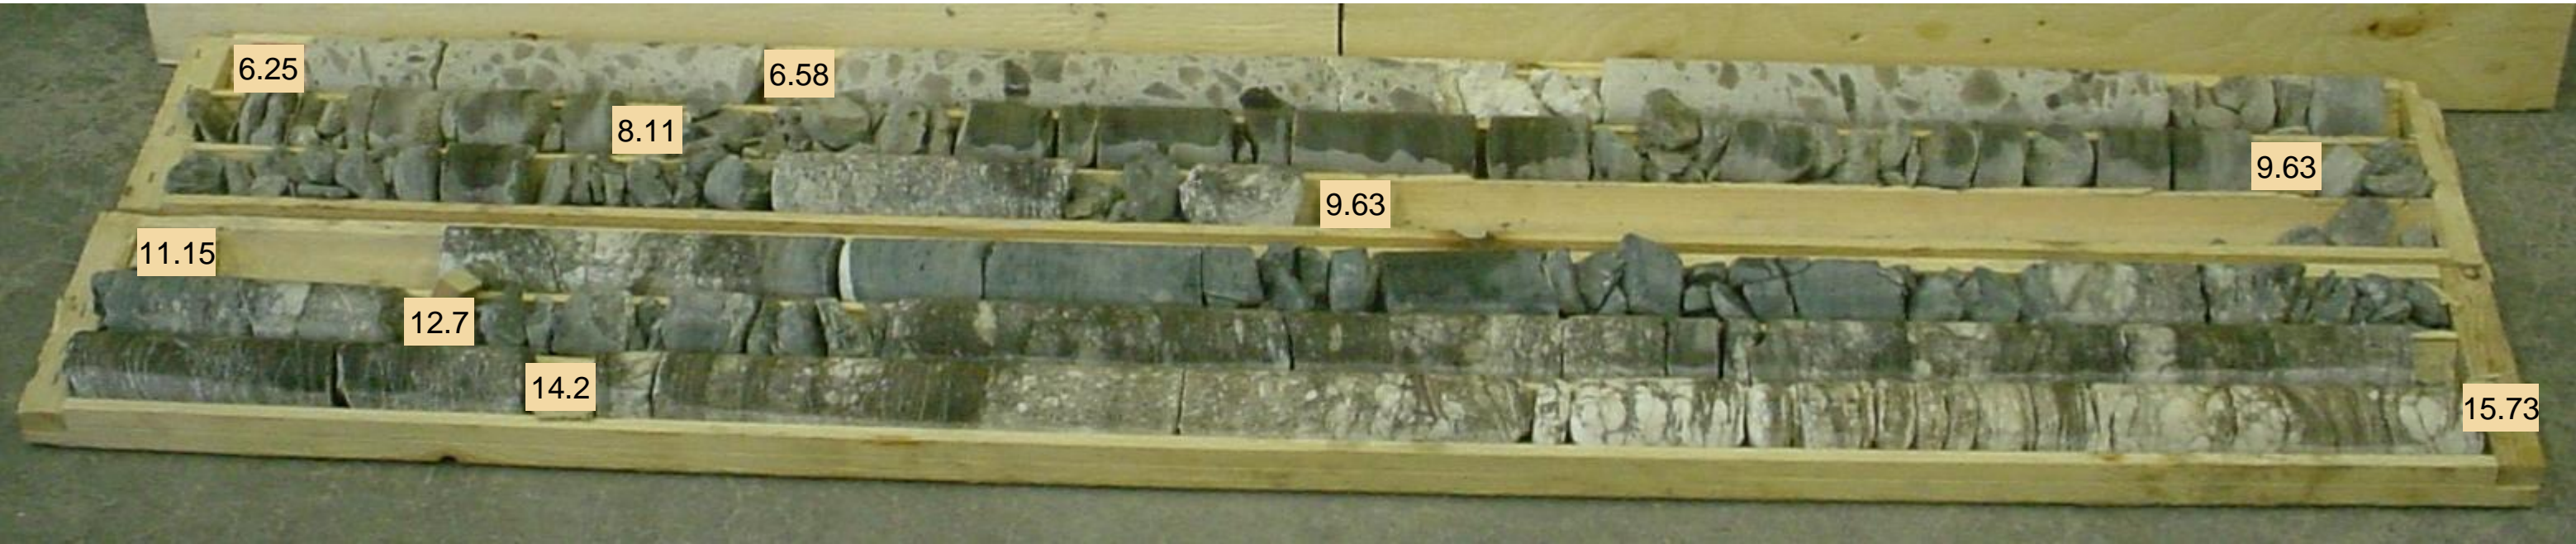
Borehole No. 103 – Rock Core. Concrete to approximate elevation 183.9 metres. Elevation 185.18 metres to 175.70 metres.
